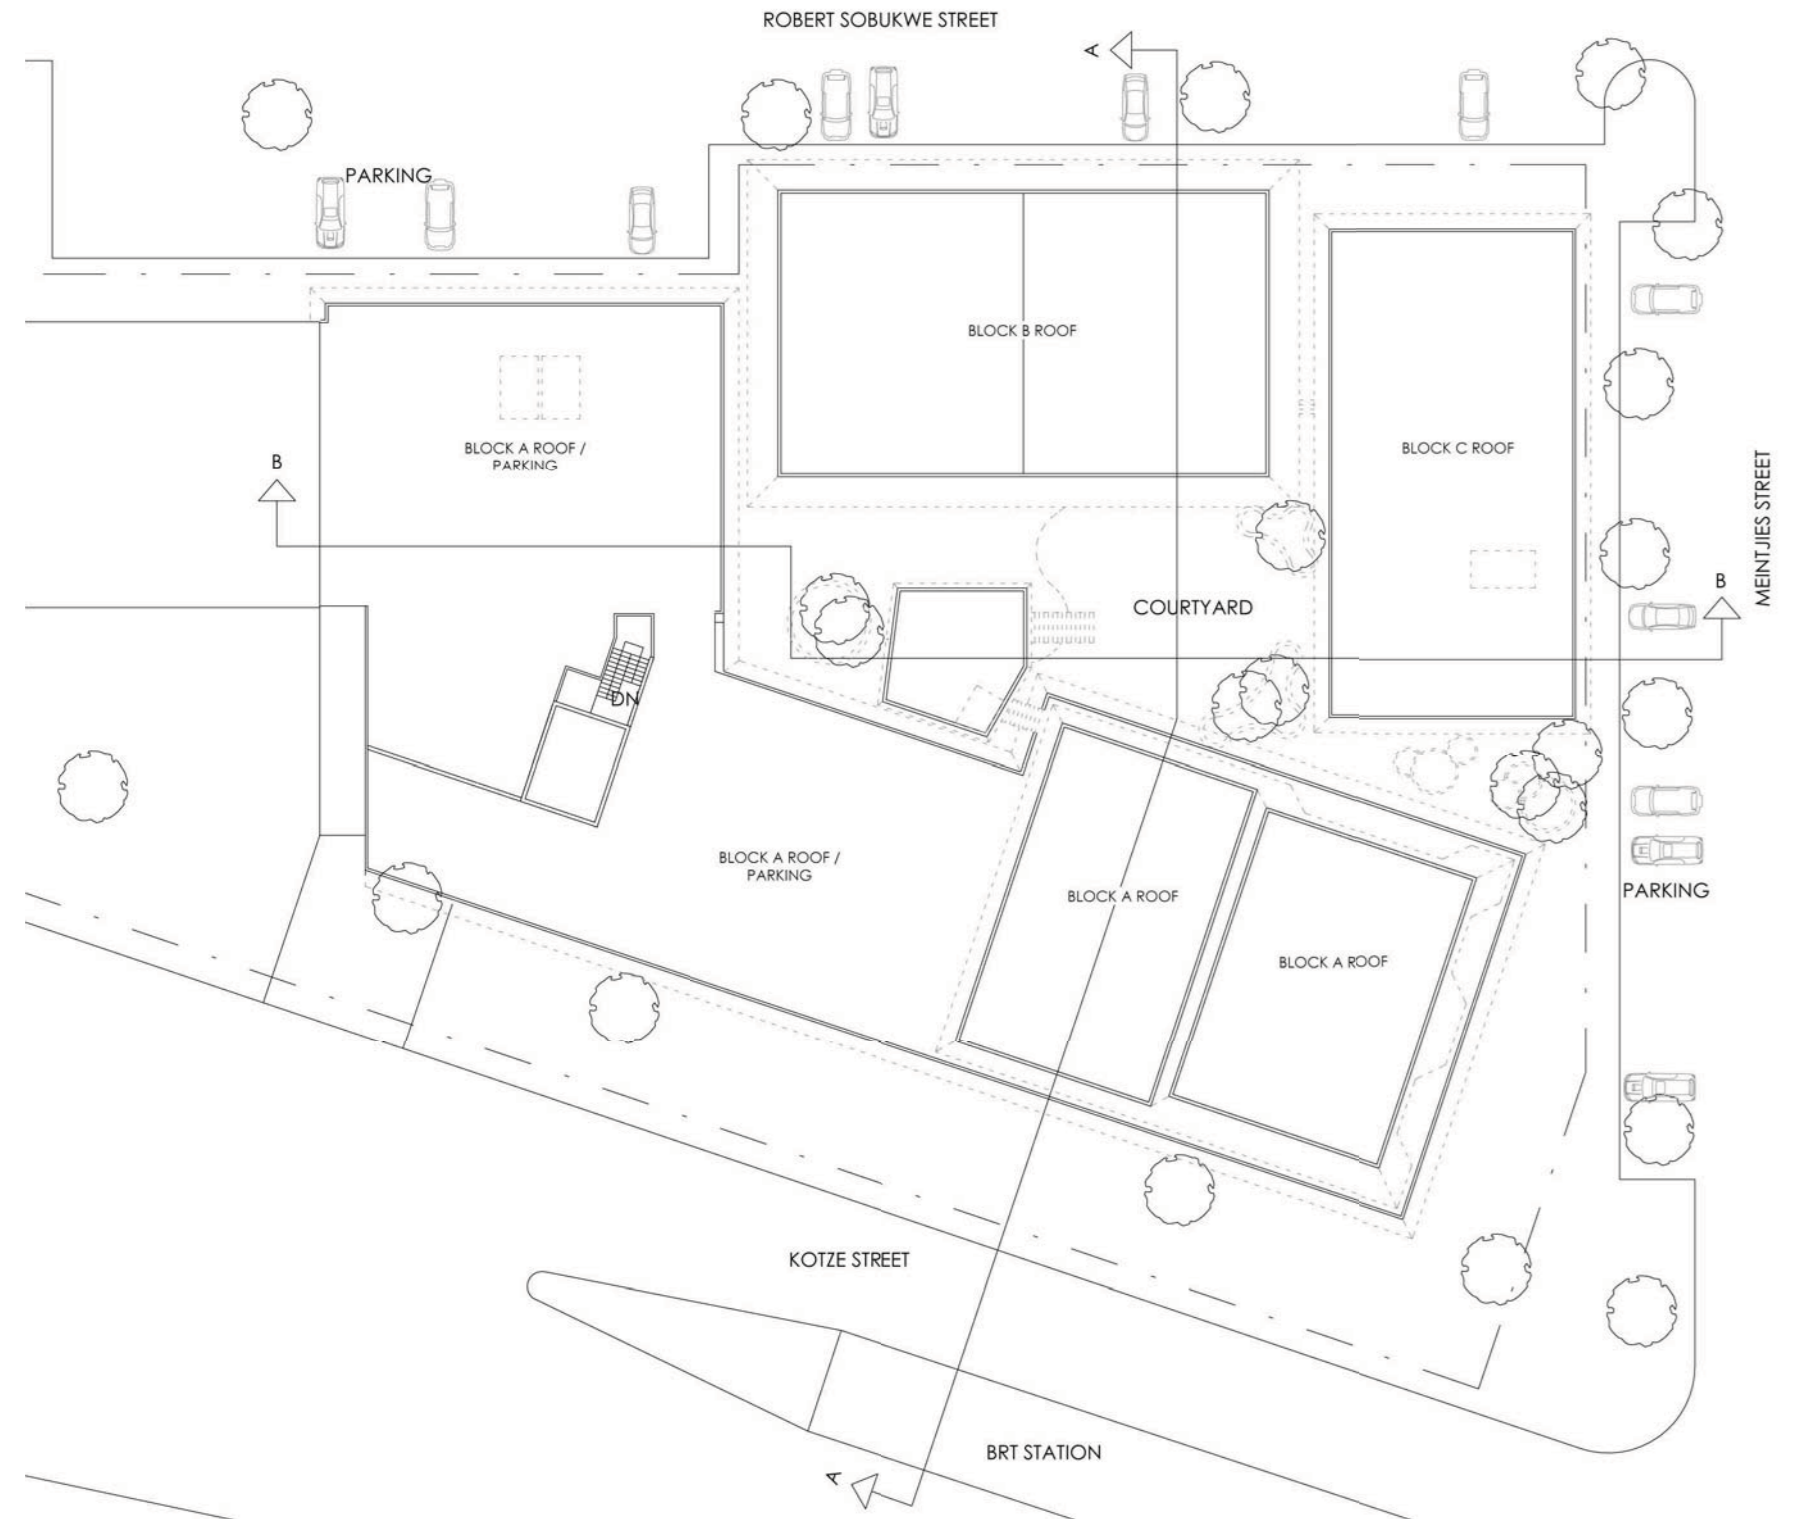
Demolitions Roof Plan Scale 1:500
